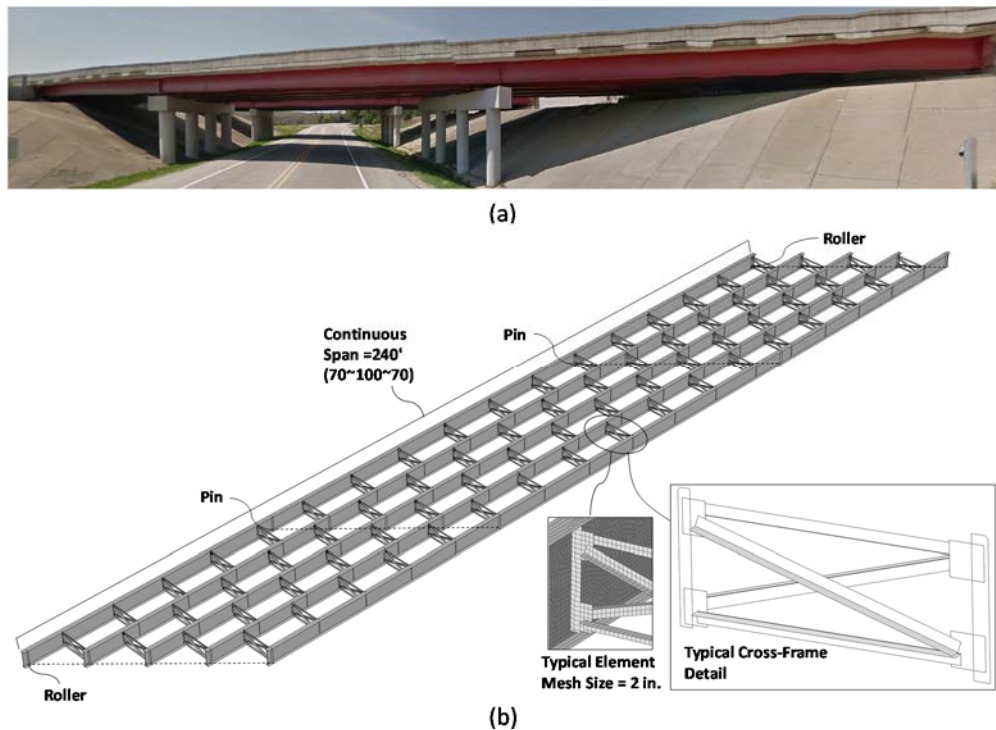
Bridge A-6243 (a) elevation picture [41] (b) ABAQUS model
